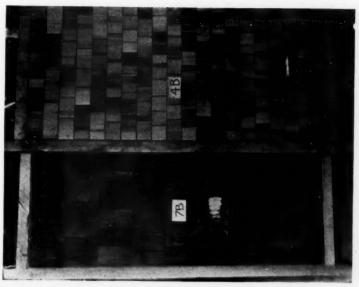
EXTERIOR OF PANEL NO. 4B, 16-IN. SHINGLES ON SHIPLAP. EXTERIOR OF PANEL NO. 7B, 24-IN. SHINGLES ON SPACED BOARDS
